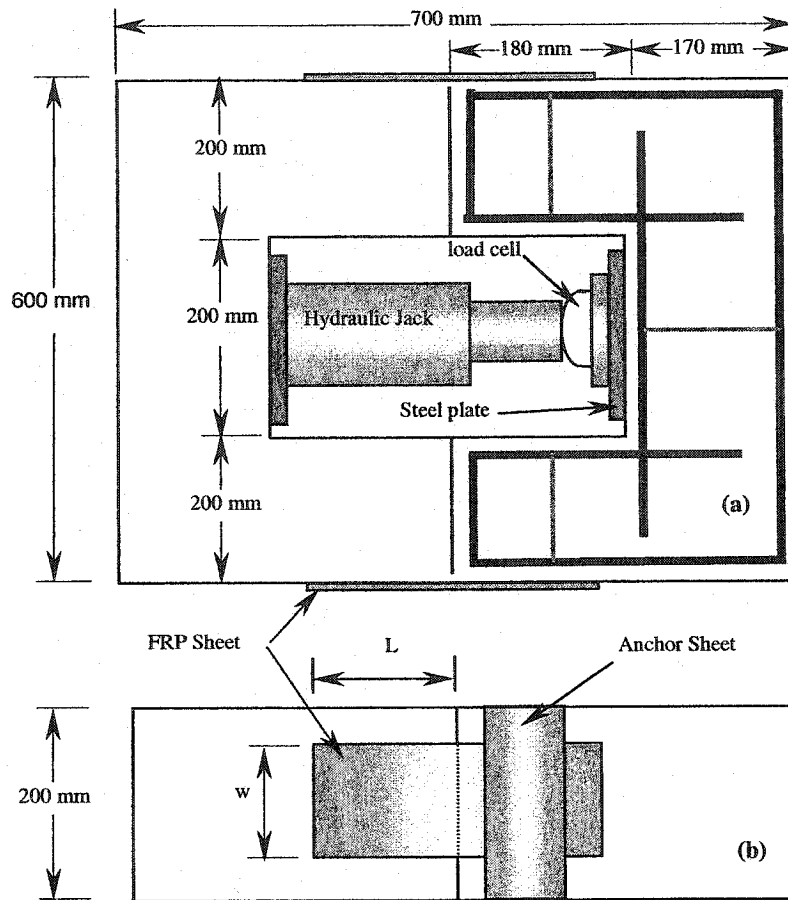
Modified push-apart test (a) plan view (b) side view
